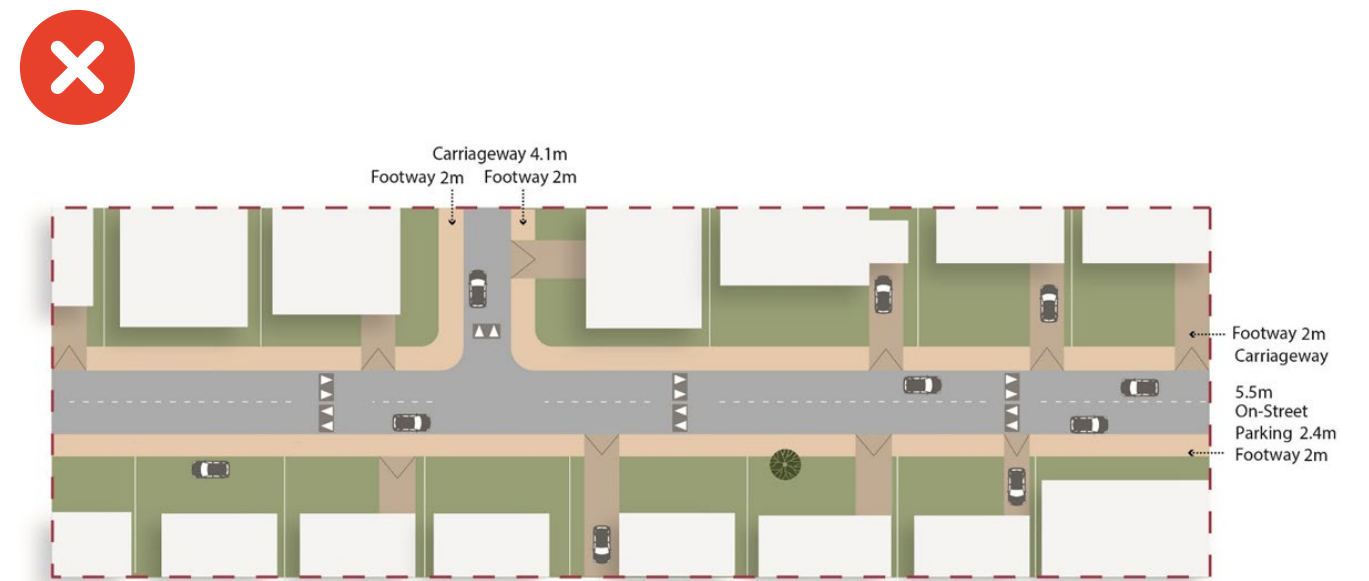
Street Typology Plan for a Poorly Designed Residential Link Street in an Urban Context
